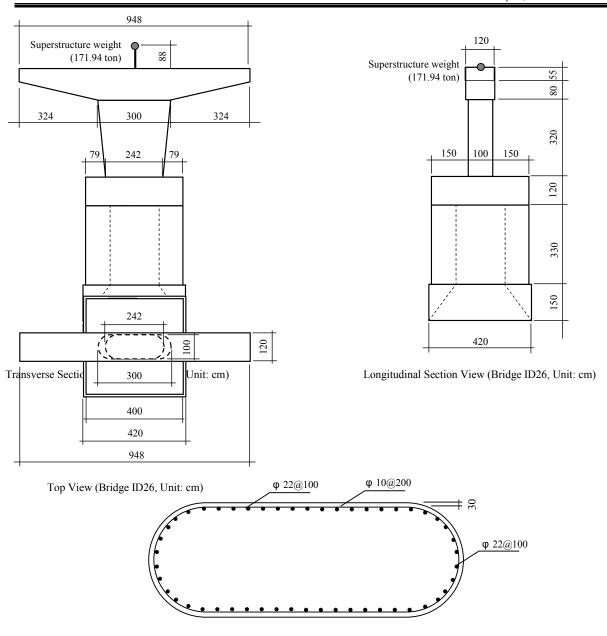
Dimension of bridge pier and bar arrangement (Bridge No.26)
